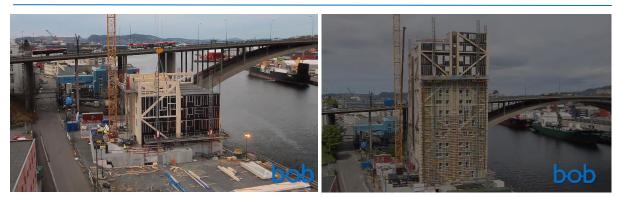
Constructions site of the Treet project. Installation of the pre-assembled Glulam structure and CLT shafts with the tower crane and scaffolding system [62]
